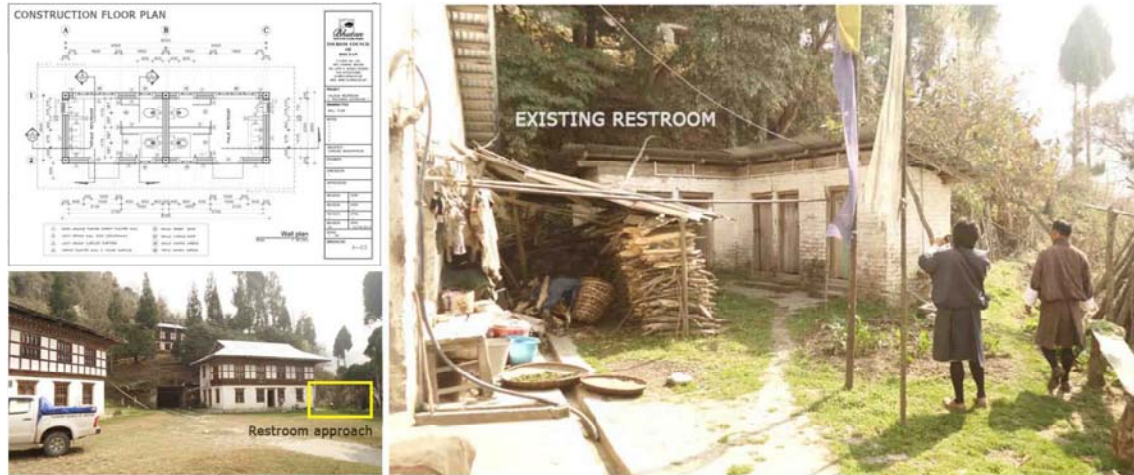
Construction site of new restrooms at handloom center in Trashigang.
